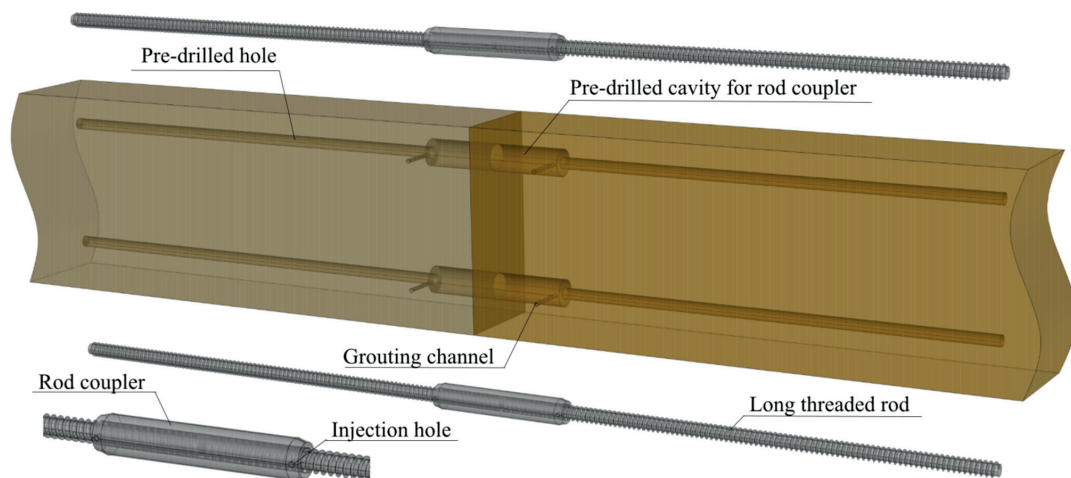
Principal layout of splice connection with long threaded rods and grout-filled couplers.
